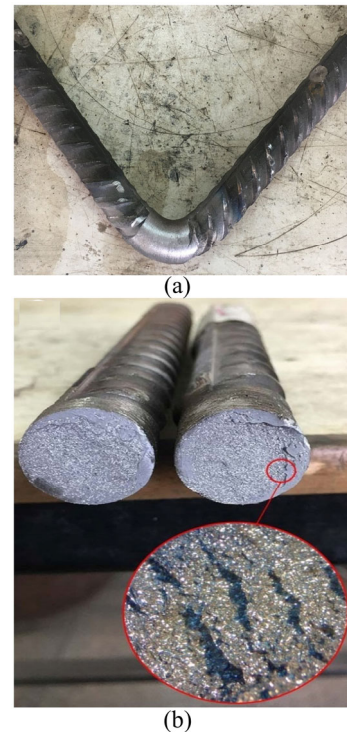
The bending behavior of welded samples under different conditions: (a) D25P25S110 and (b) D18P17S40.
